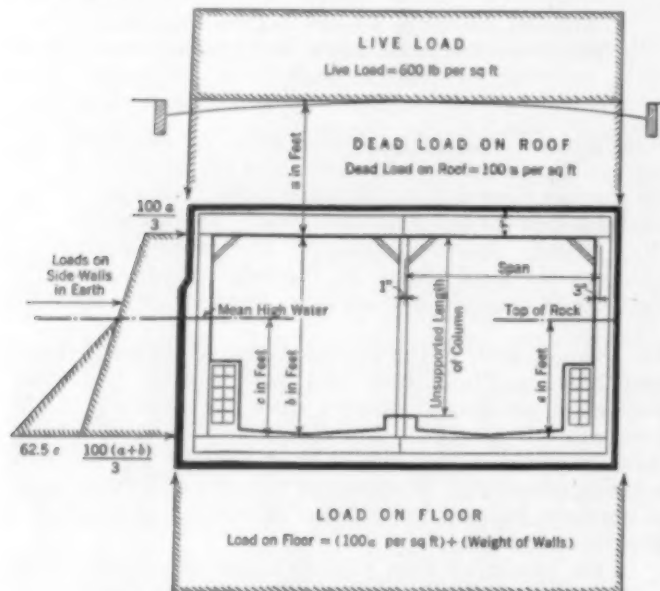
LOADING DIAGRAM FOR SUBWAY DESIGN
